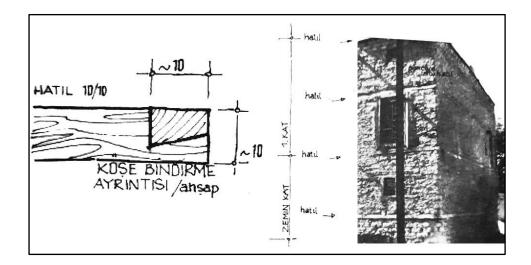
On the left, dimentions of lintels and junction point detail of them; on the right, locations of lintels in a mud brick masonry walls of a house in Elbistan. The visual is produced by utilizing an illustration and a photo from (*Çelebi, 2012, p. 92*)
